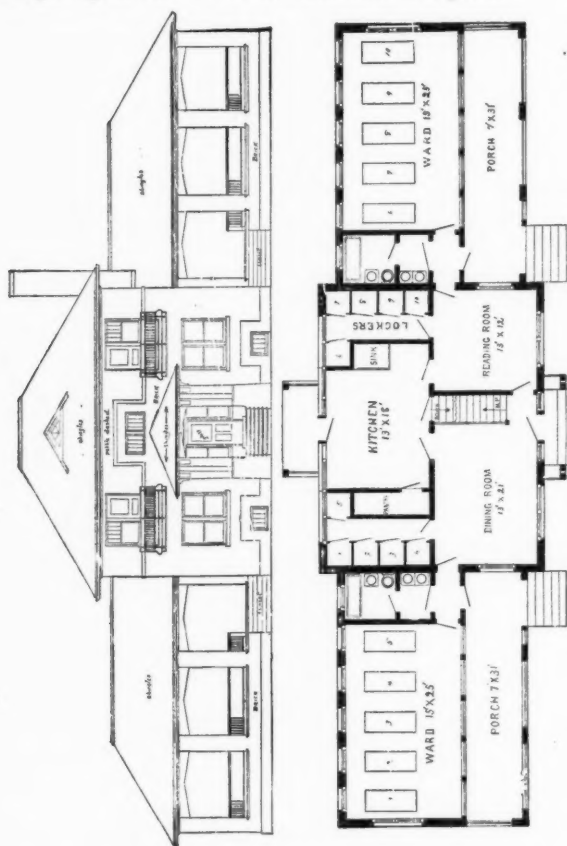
A DESIGN FOR A SMALL VILLAGE OR TOWN HOSPITAL OR SANATORIUM : FRONT ELEVATION AND FLOOR PLAN. CAPACITY, FOURTEEN PATIENTS; ESTIMATED COST, \$15,000.
